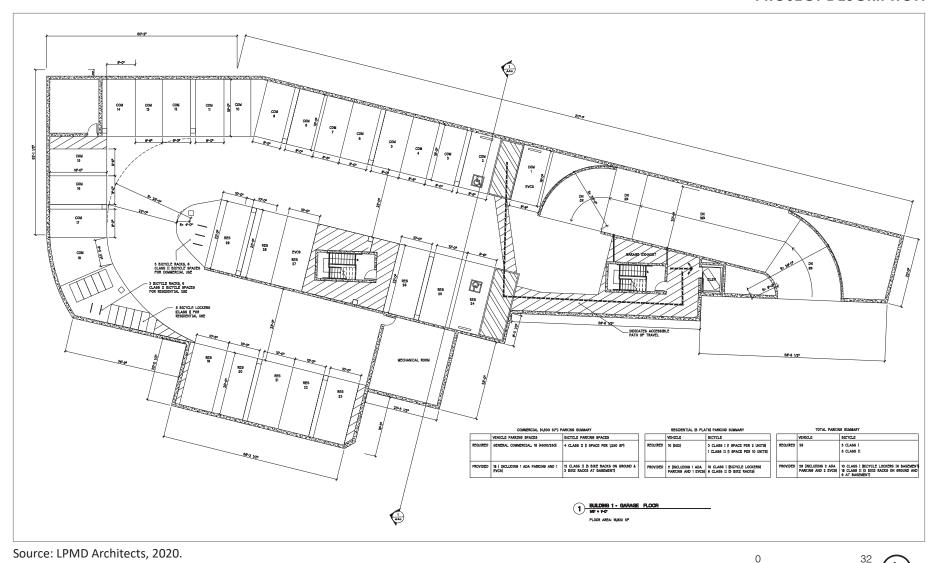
Mixed-Use Building Subterranean Parking Level
